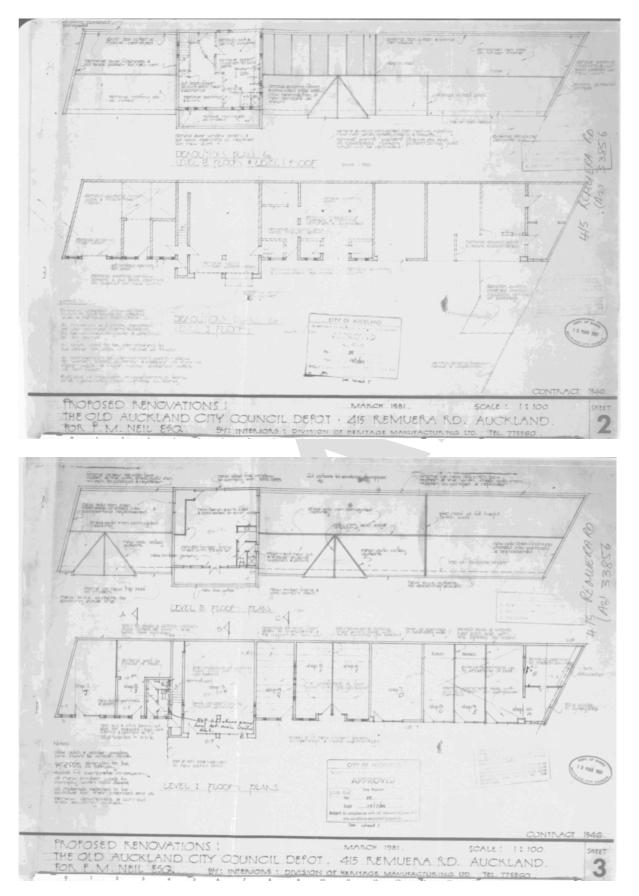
Architectural drawings showing the internal alterations proposed to the former stables buildings, 1981 (AKC 339, Building Permit and Consents Aperture Cards 1908-1997, Auckland Council Archives).
